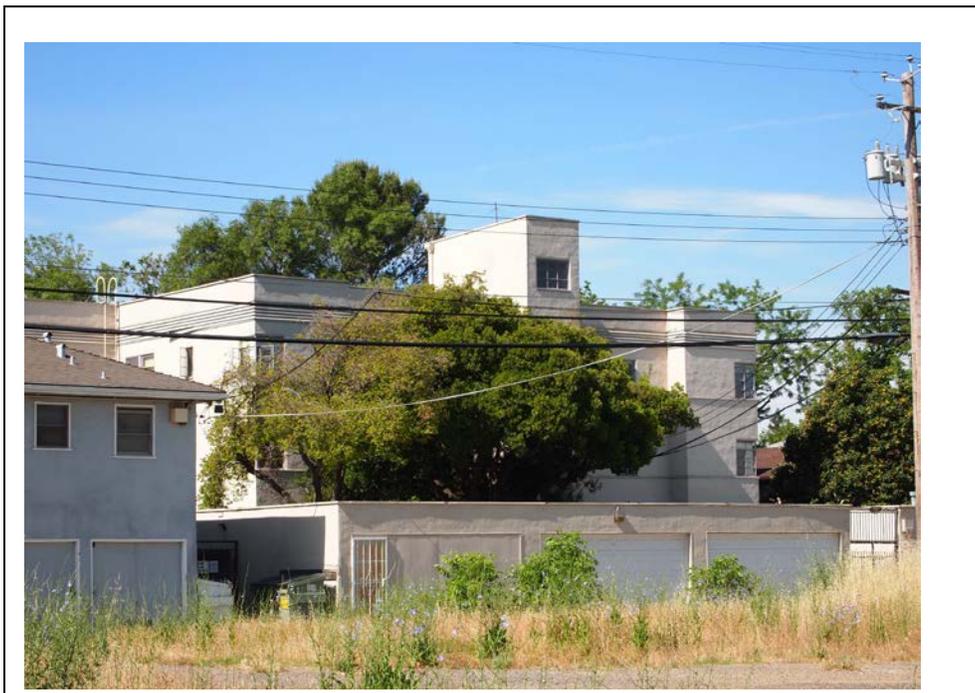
View of the garage and rear side of the building with elevator shaft shown, camera facing southwest.
